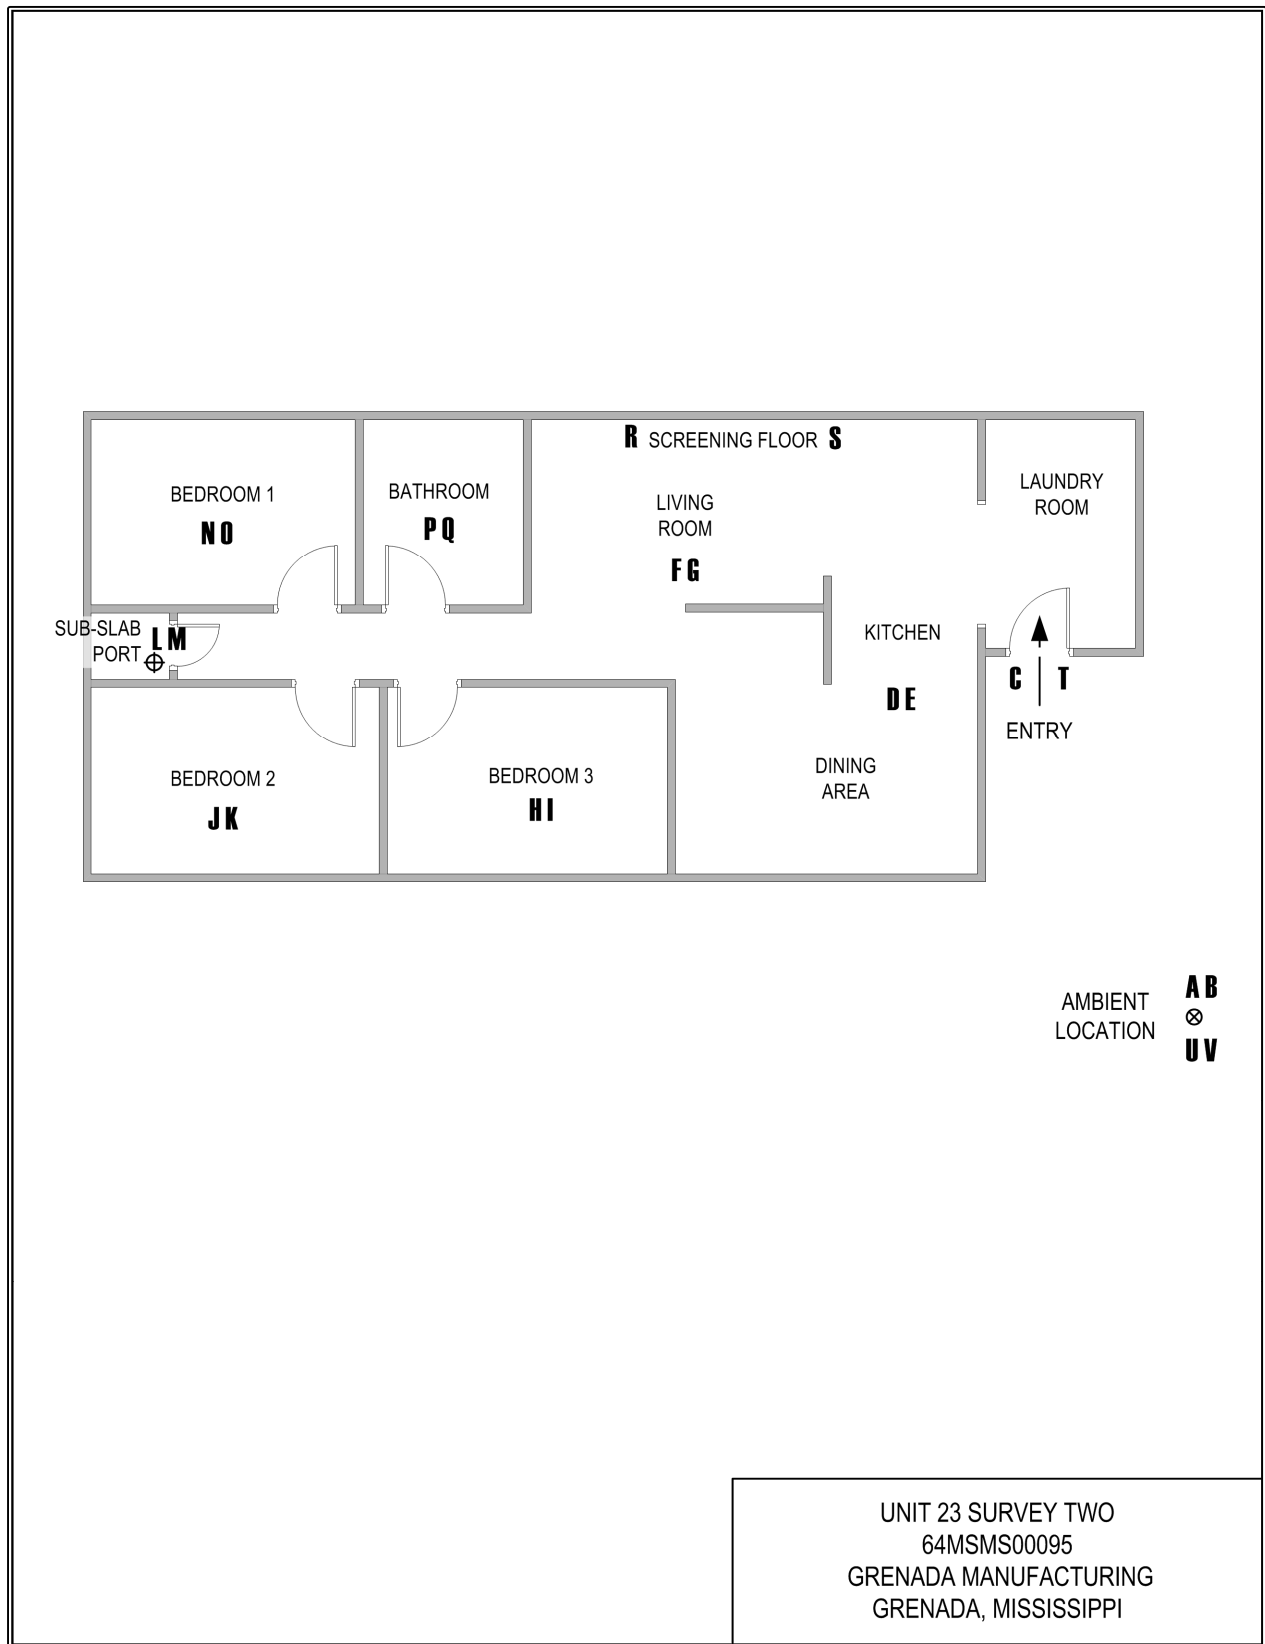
Unit 23 Survey Two Floor Plan, 64MS00095
